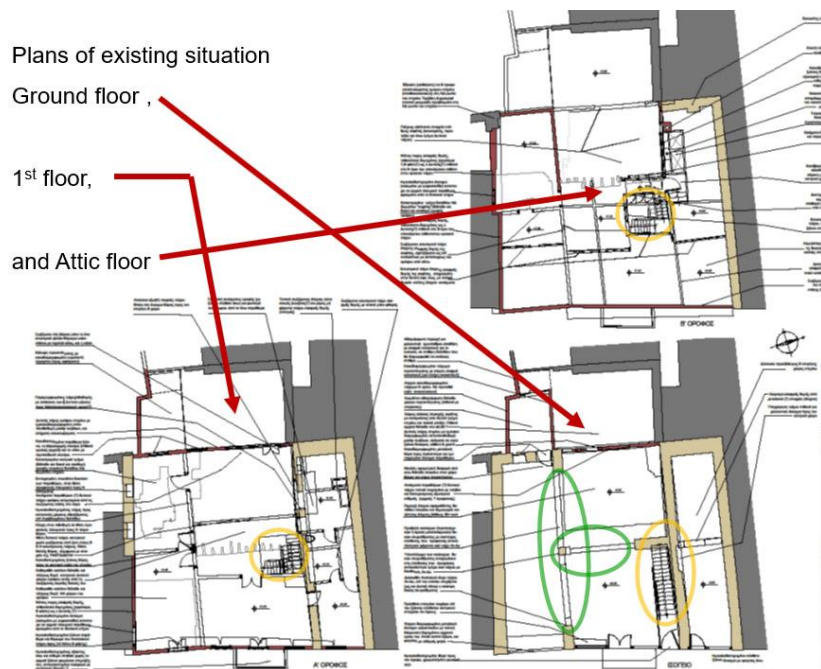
Plans of existing situation Ground floor , 1st floor, and Attic floor
